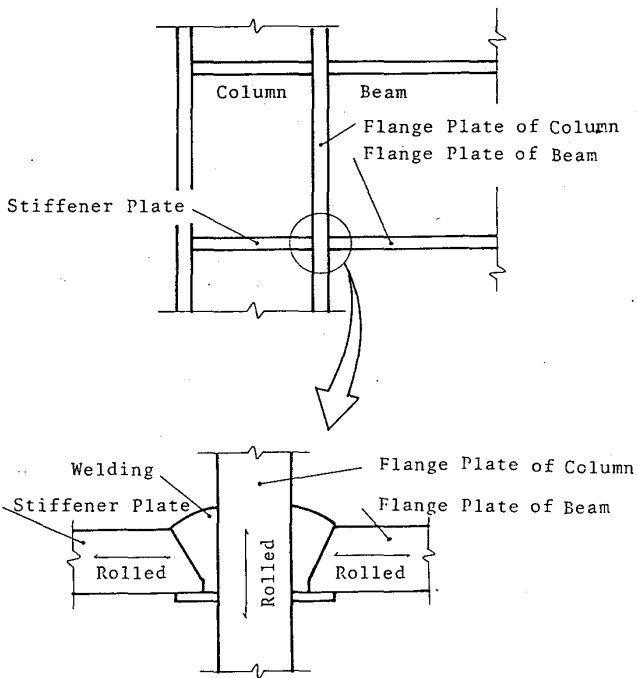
Test specimens of welded beam-to-column connections (A-Type specimens)
